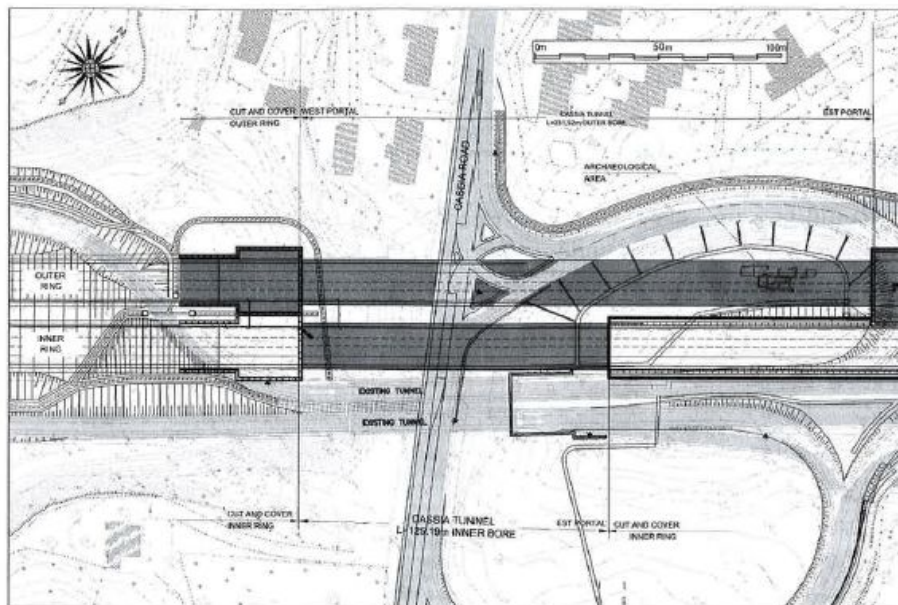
Plan view of the new Cassia tunnels with Cassia road, archaeological site, and the two existing tunnels.
